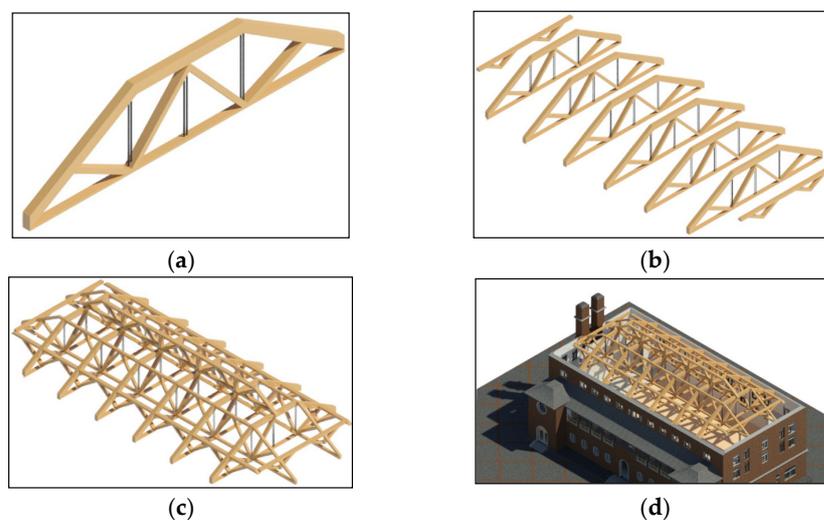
Three-dimensional model of beam frame family (source: author). (a) A roof truss. (b) Multiple roof trusses. (c) Tandem roof trusses. (d) Arrangement of roof trusses.
